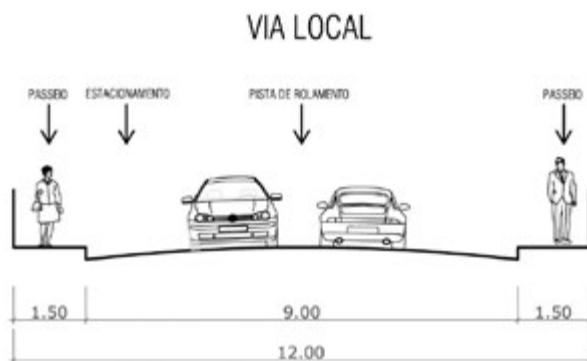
Cross section of a standardized generic local street proposed in the Master Plan of Biguaçu, Brazil.
